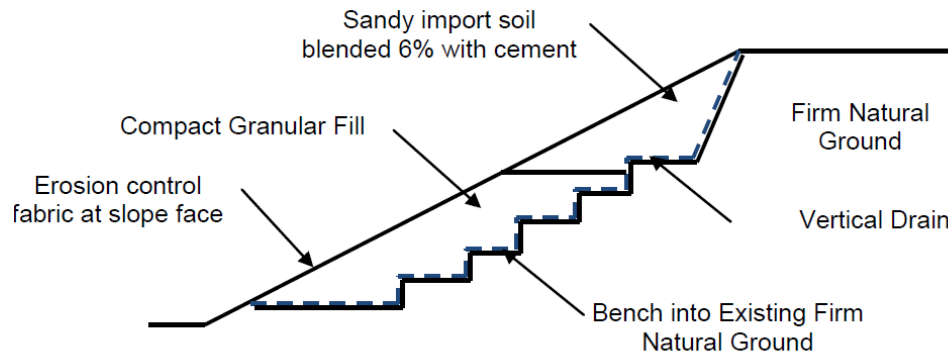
Soil cement repair of surficial slope failure (Day, R. W., 1996)
